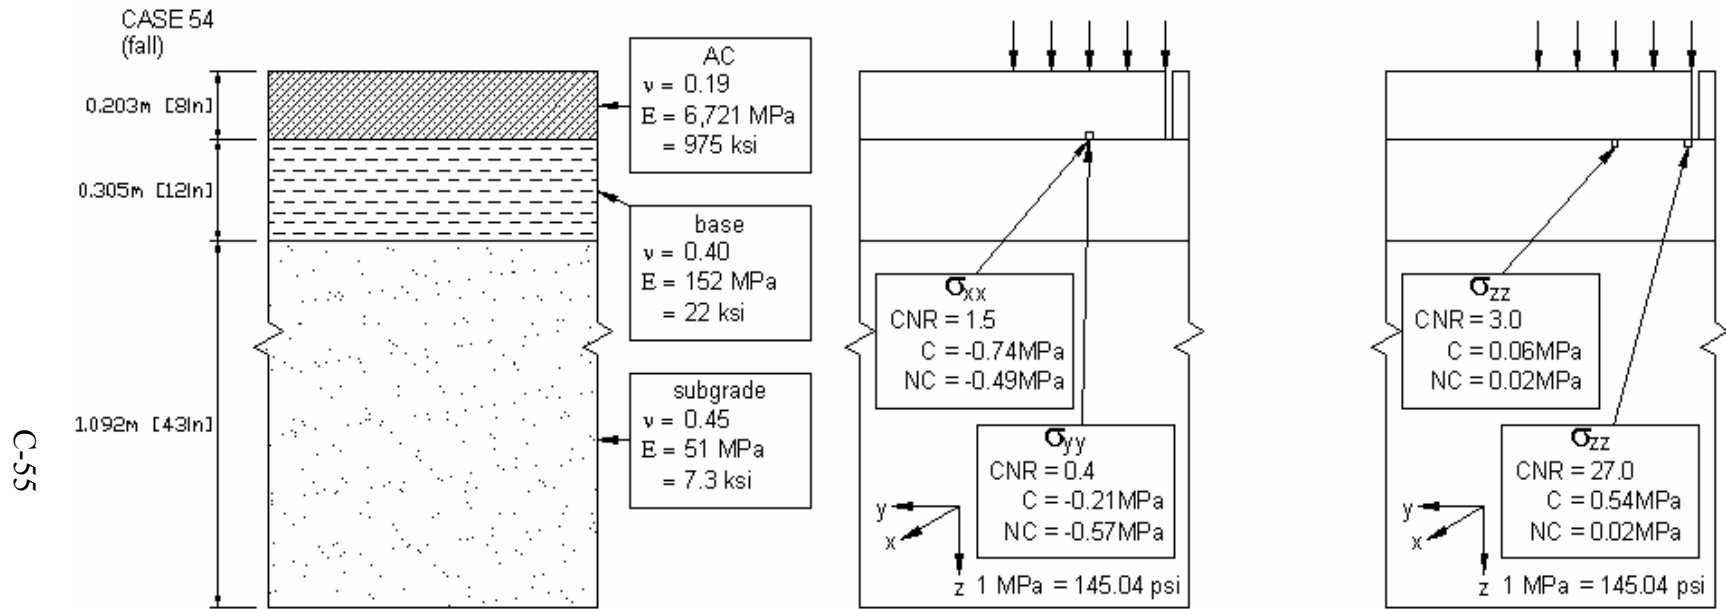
Summary cross section for case 54, (C – stress in cracked pavement, NC – stress in pavement with no crack, CNR – crack/no crack (stress) ratio)
